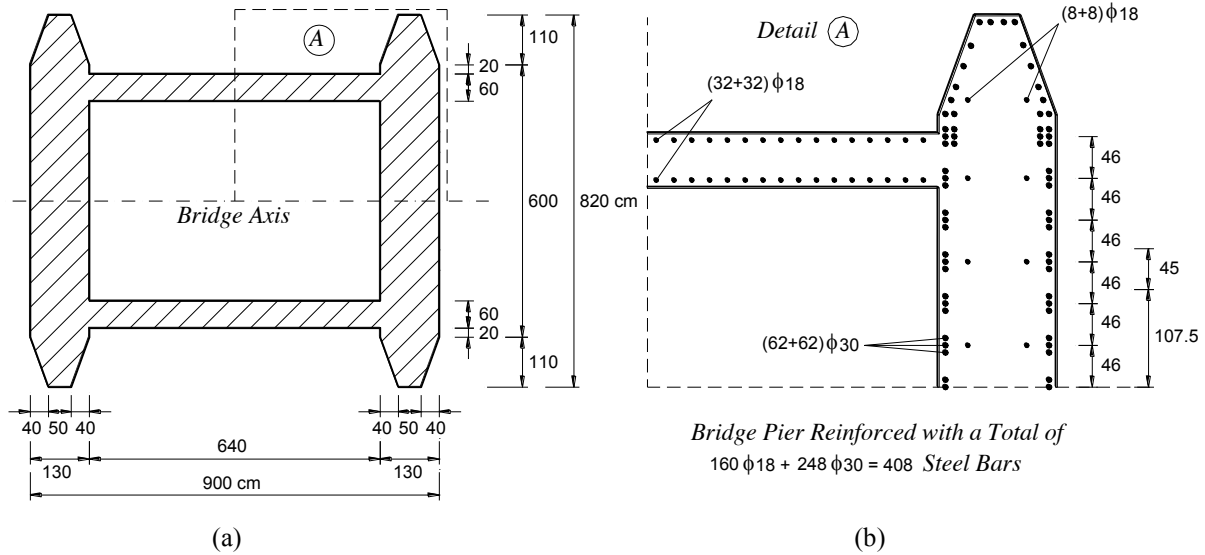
Box cross-section of a bridge pier. (a) Geometrical dimensions. (b) Detail with reinforcement layout.
